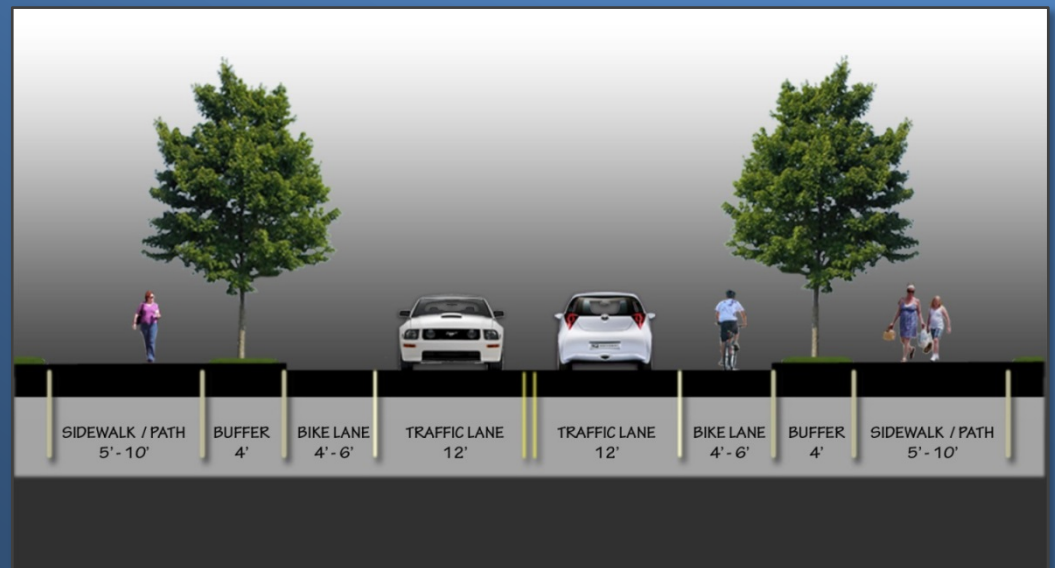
Typical roadway cross section for a "complete street" with sidewalks, bike lanes and landscaping.
